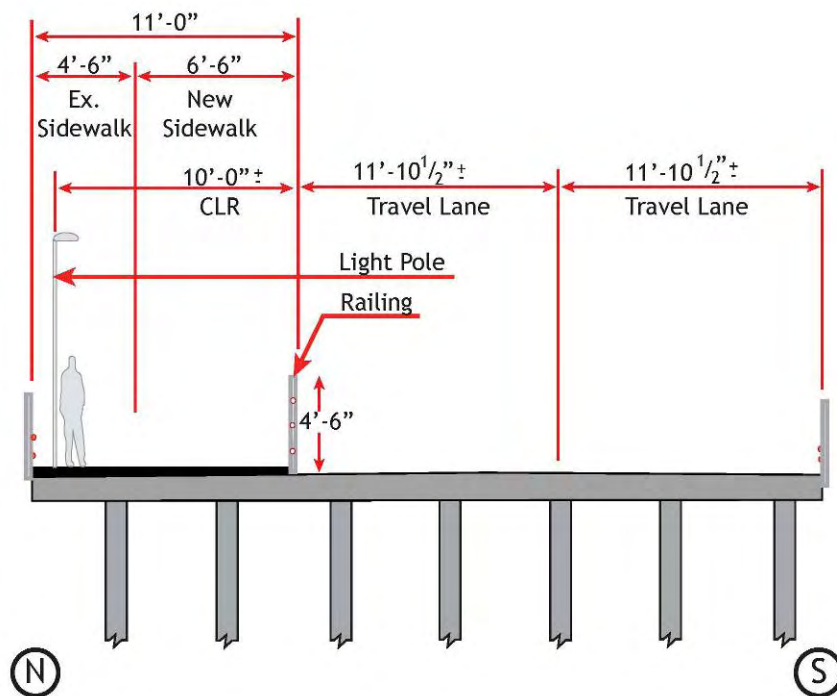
Proposed Crossing of Dry Creek Using Existing Darling Way bridge
